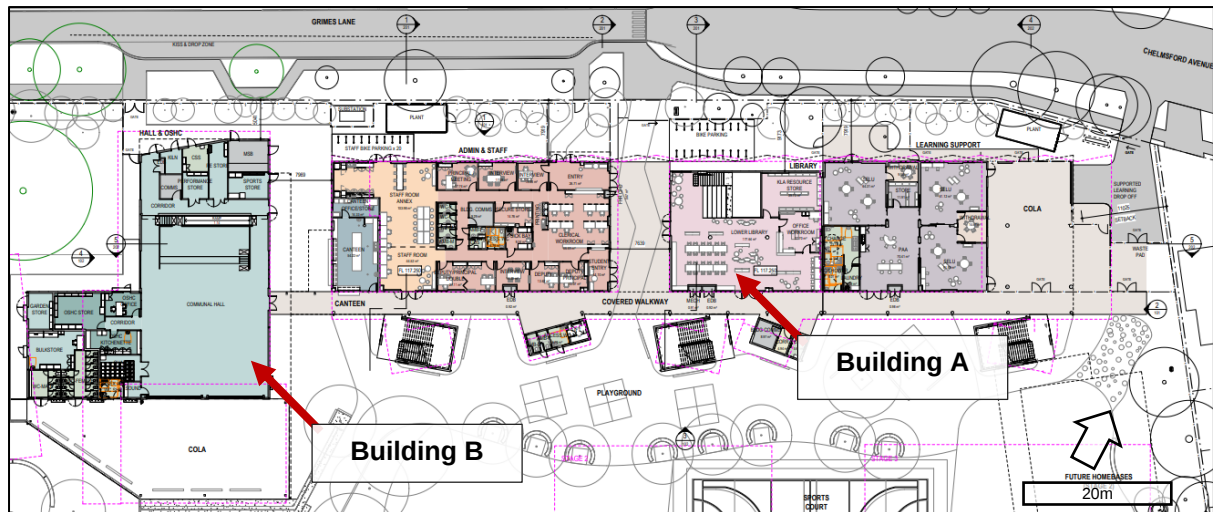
| Stage 1 Ground floor layout (Source: Applicant's RtS 2021)
